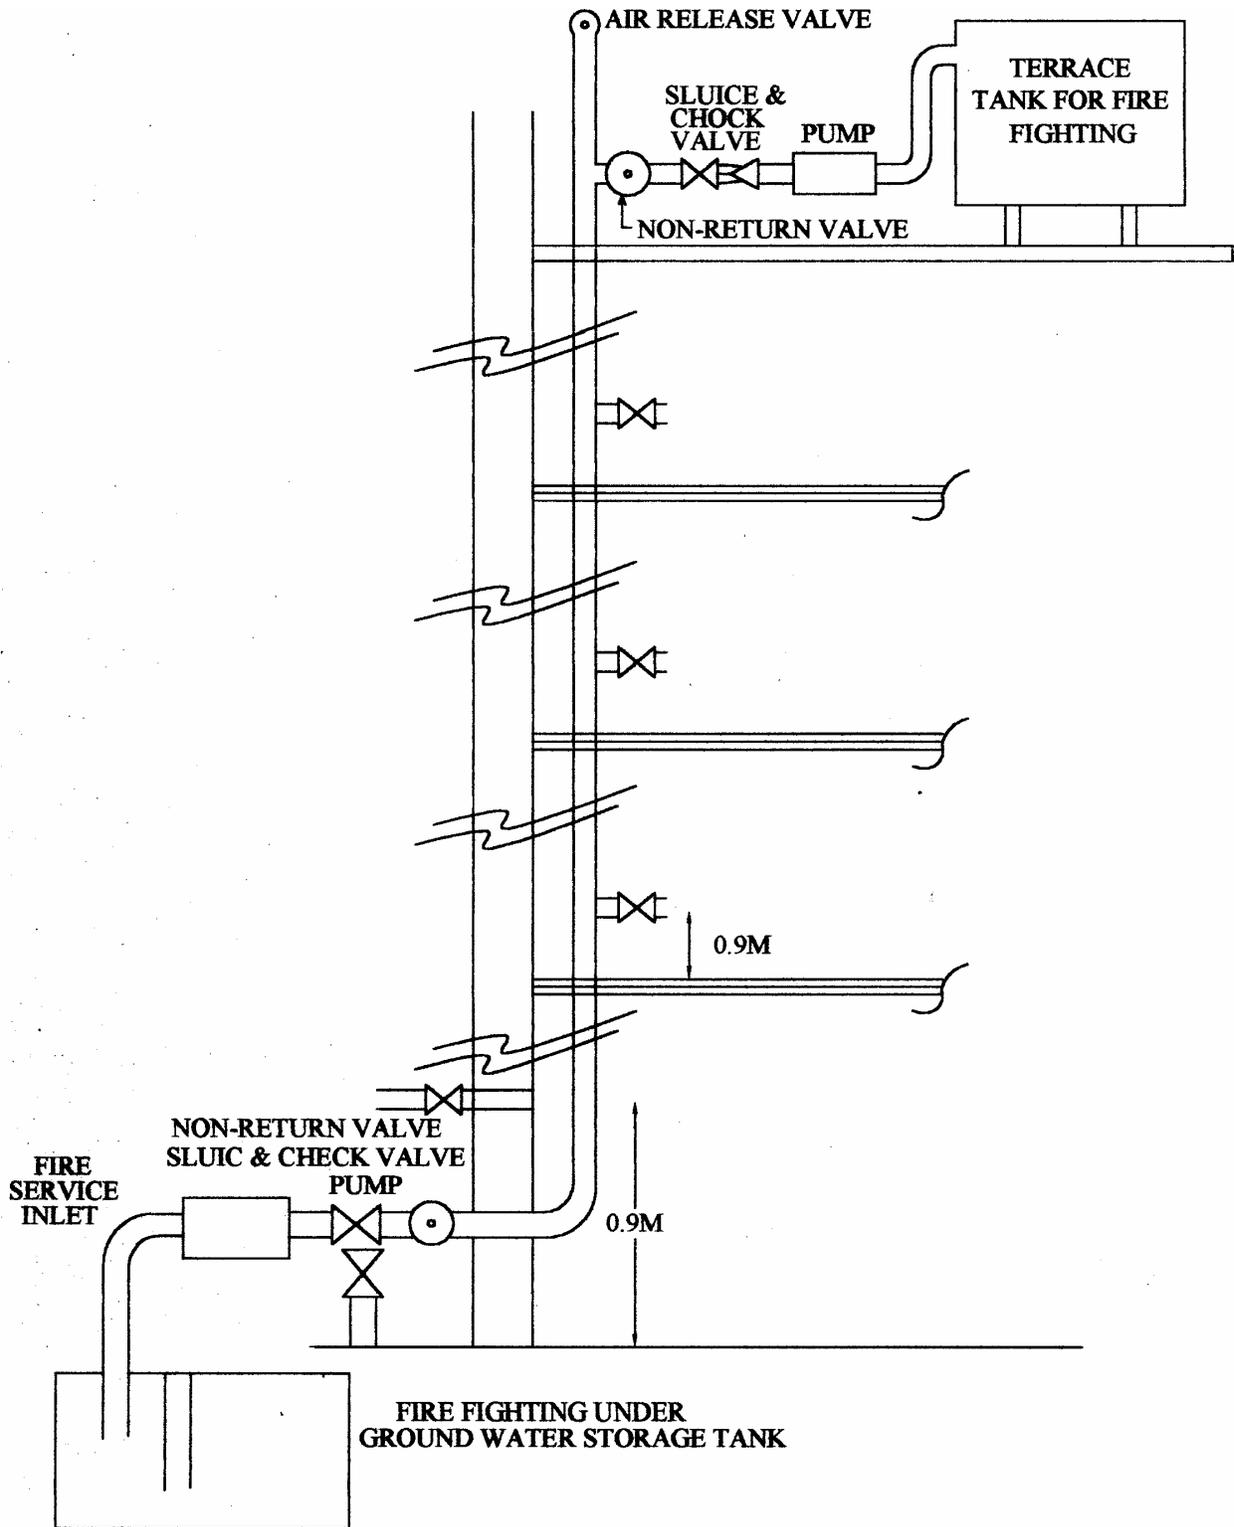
APARTMENT BUILDINGS EXCEEDING 13M
